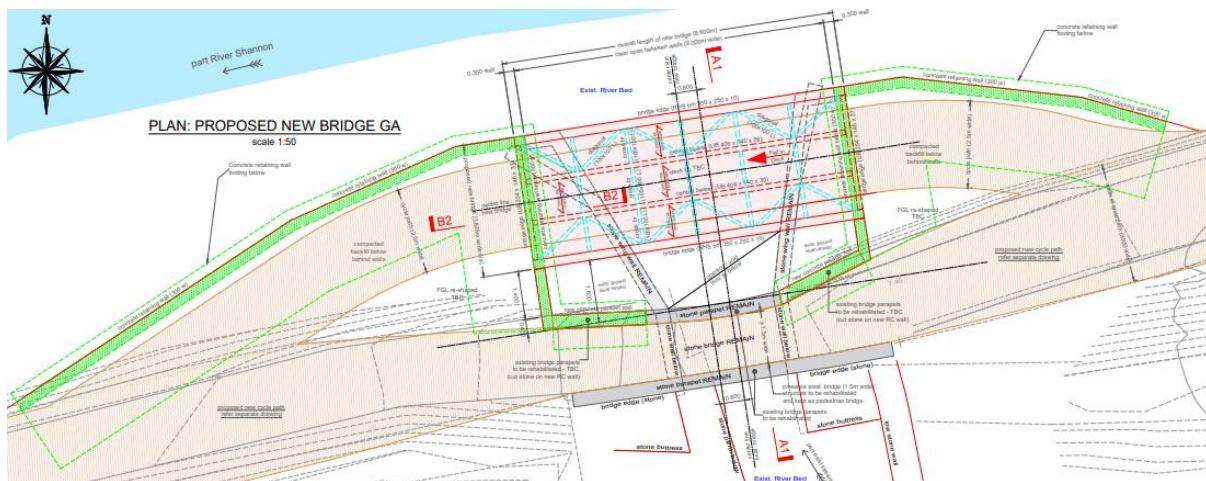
Plan for the proposed new bridge 2 alongside the existing stone bridge (refer to drawing RHA-XX-DR-S-SP0021)
